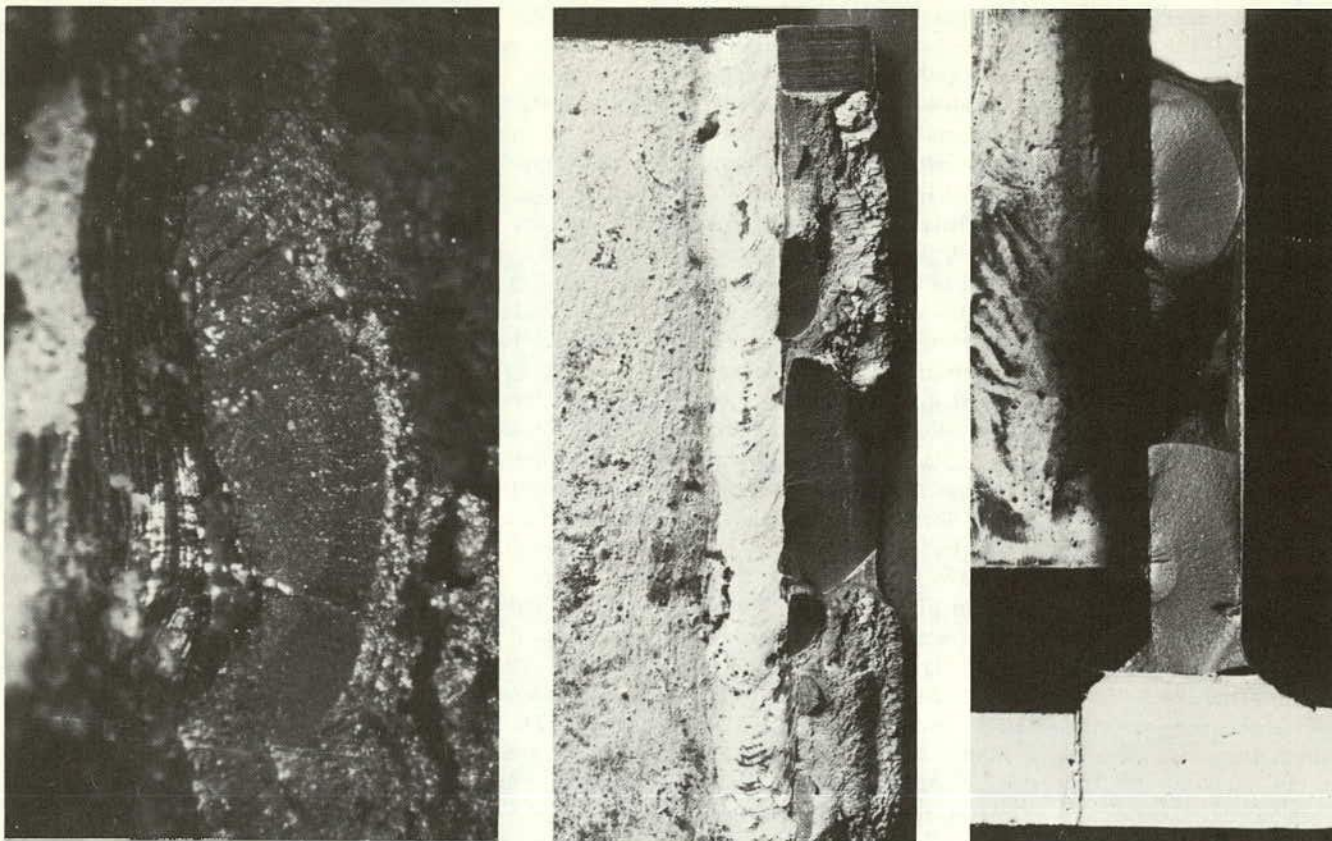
Fatigue crack at toe of Type 1 stiffener-to-web weld, showing: (left) 0.035-in.-deep crack (SCB243), (center) multiple fatigue cracks, and (right) multiple fatigue cracks through web.
